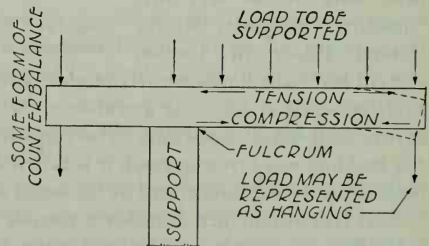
Forces upon a steel beam used as a cantilever.
